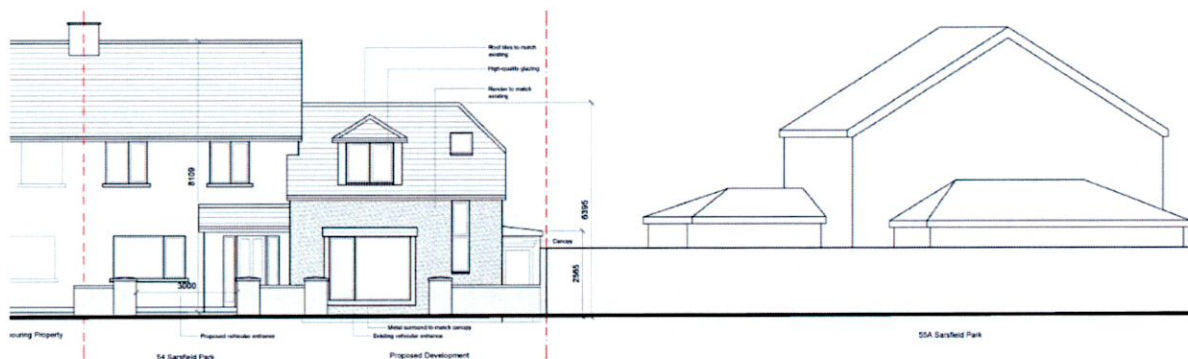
Front Elevation: the proposed house has been designed to mitigate the impact on neighbouring properties.
